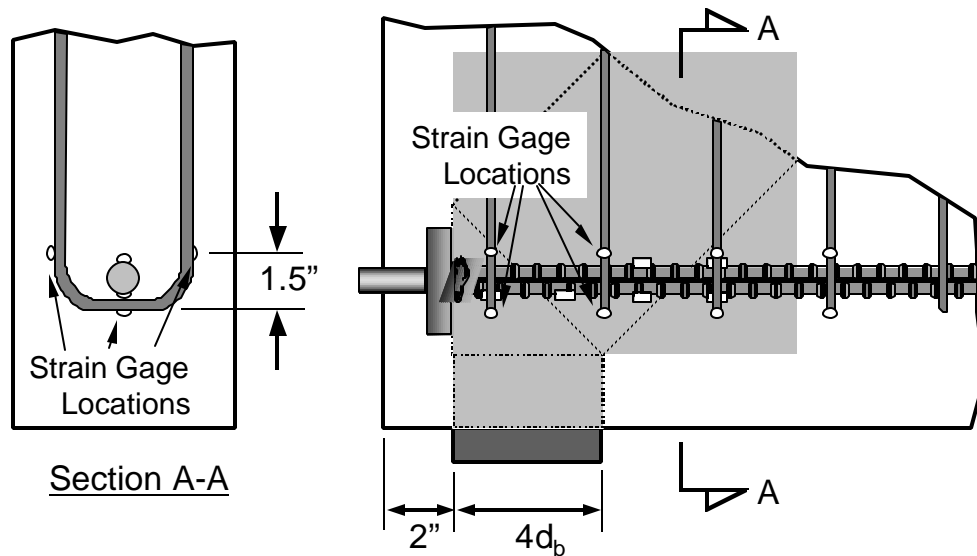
Placement of instrumentation on stirrups of confined specimens
